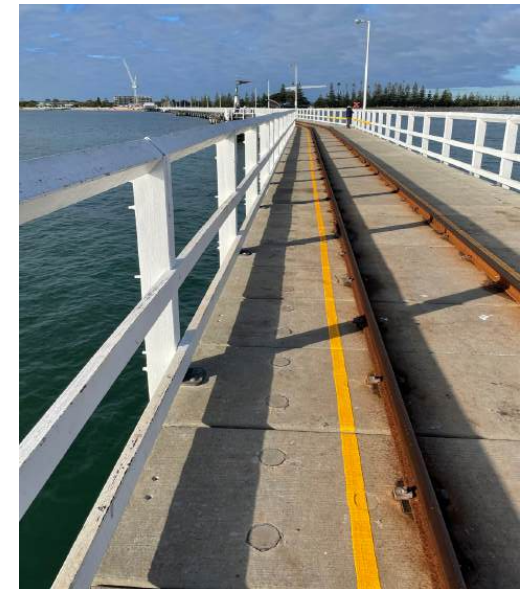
View of Jetty Section 3, Busselton Jetty. H+H Architects, 2022.
